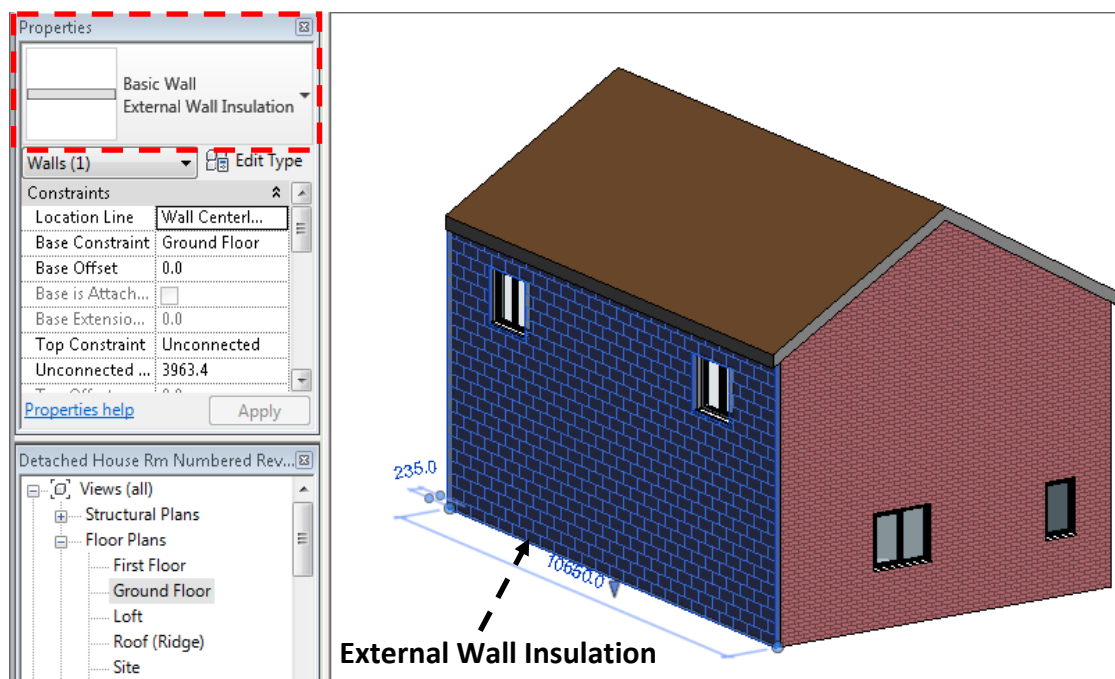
BIM (Revit) Model with External Wall Insulation
